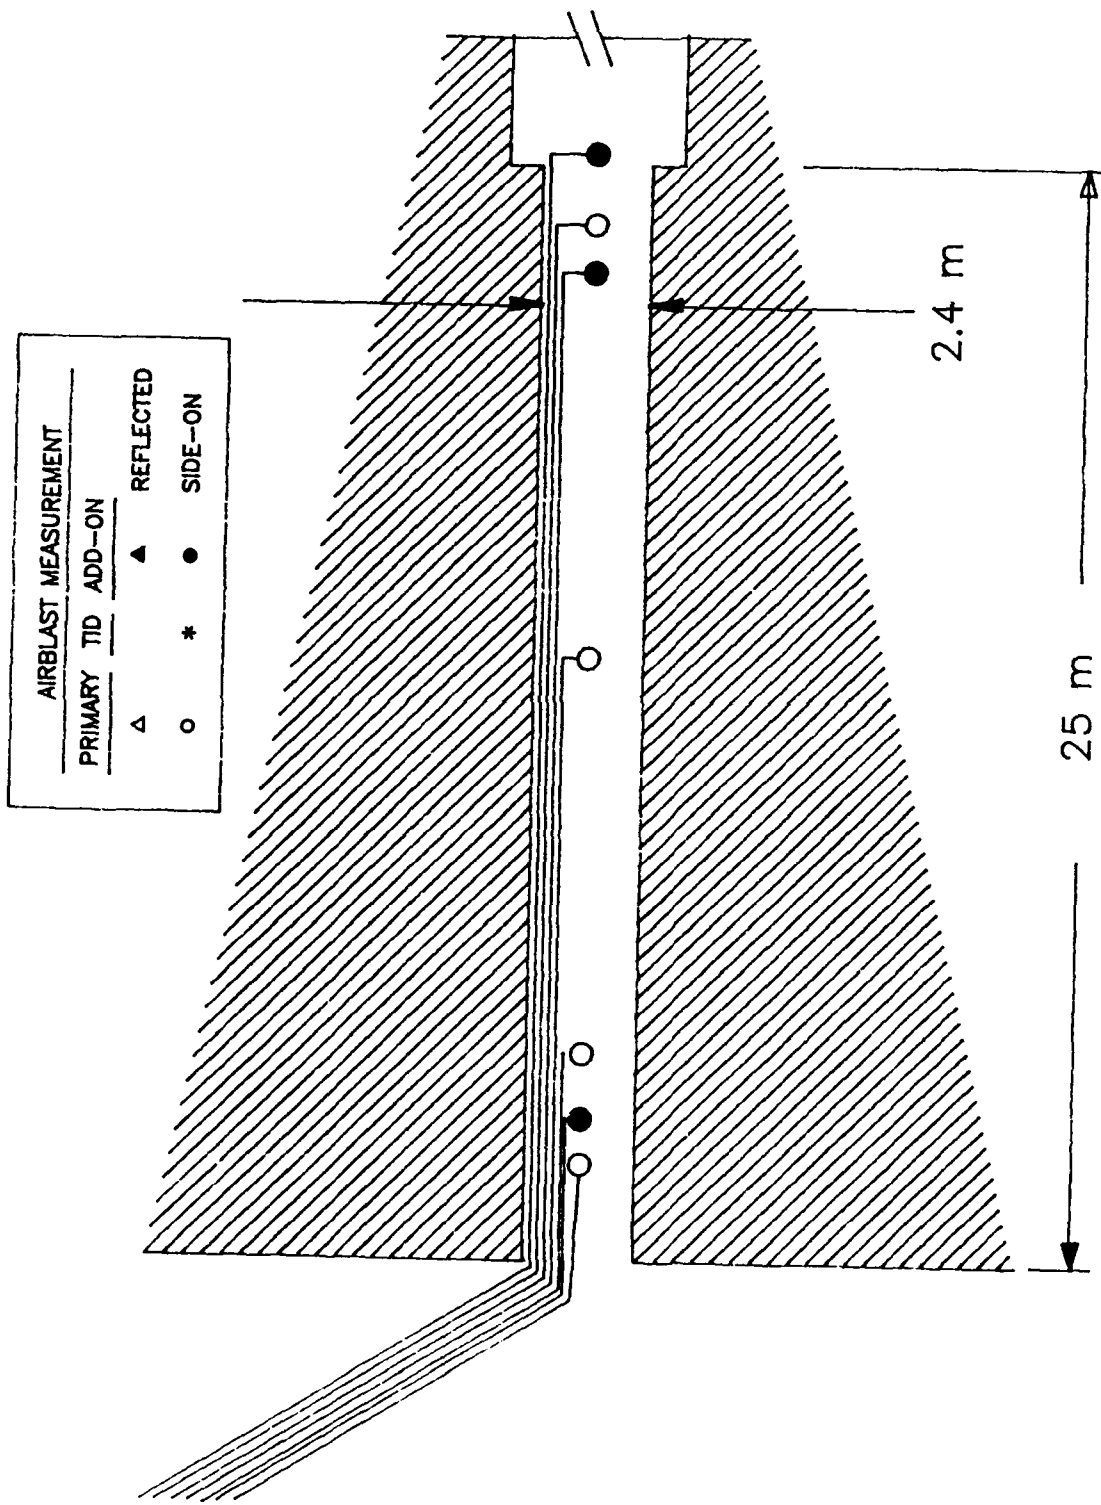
Cable protection schematic for interior airblast gage signal lines on Shallow Underground Tunnel/Chamber Test Program.
